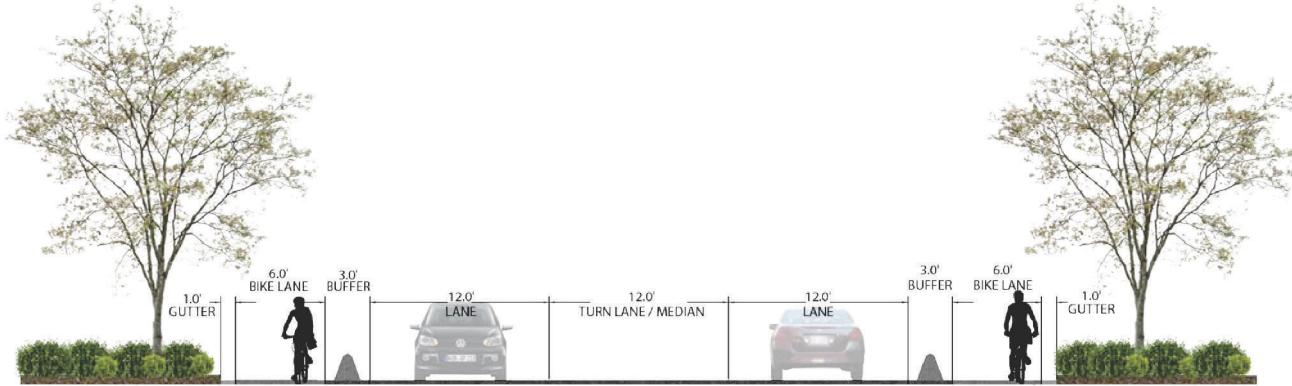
East Jordan Canal Trail typical sections of bike lanes on Creek Rd from Union Park Ave to Aspire Surgical.
